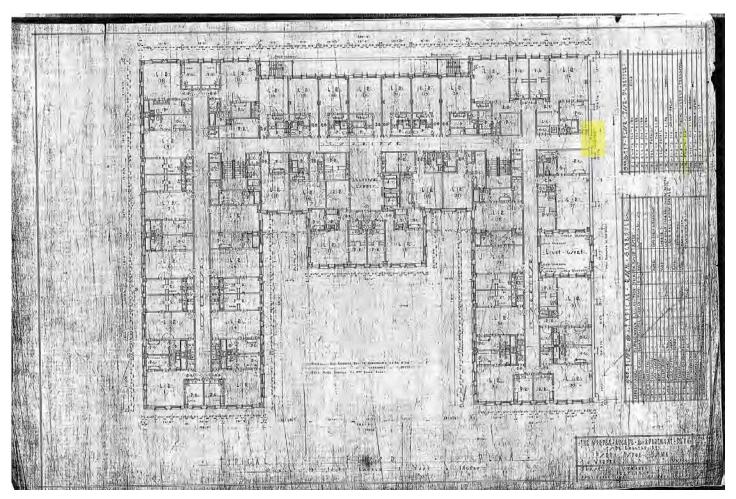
Damon, O'Meara & Hills, The Warden Shops and Apartment Building, Typical Floor Plan, 1923. The highlighted area of the drawing illustrates the 5 x 7 opening to be cut for corridor access and flow.
